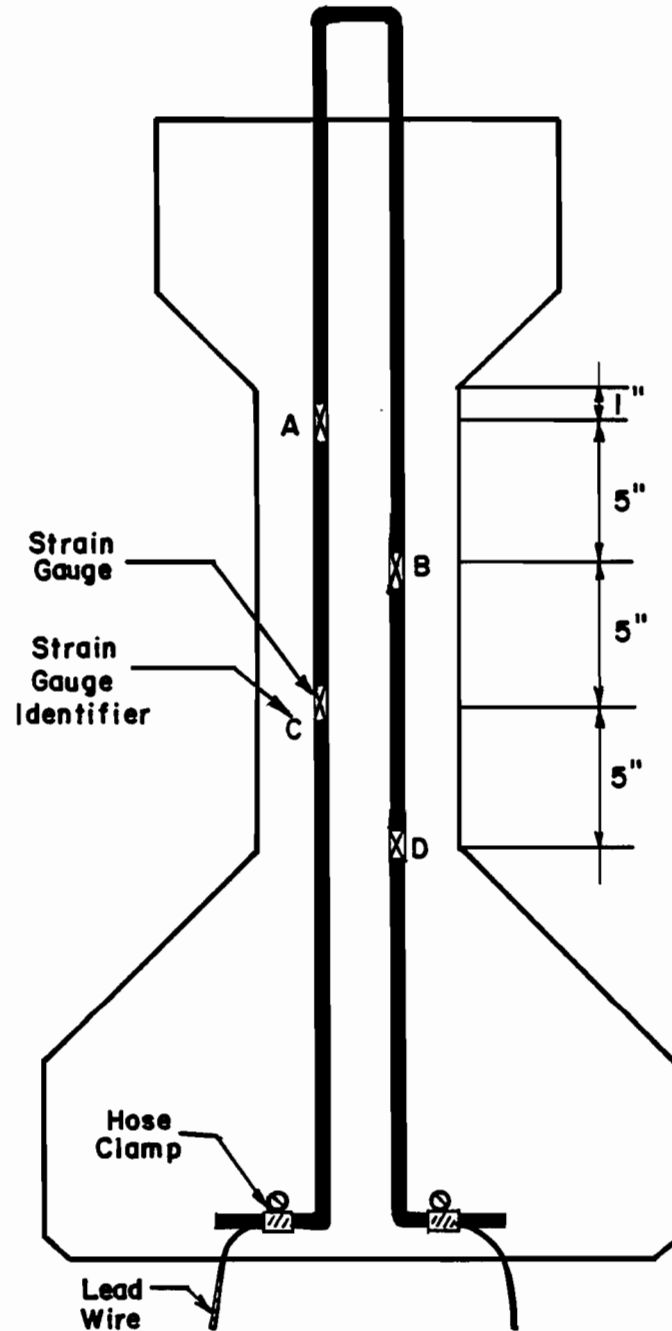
Electrical strain gage placement and lead wires for detecting stirrup fractures
